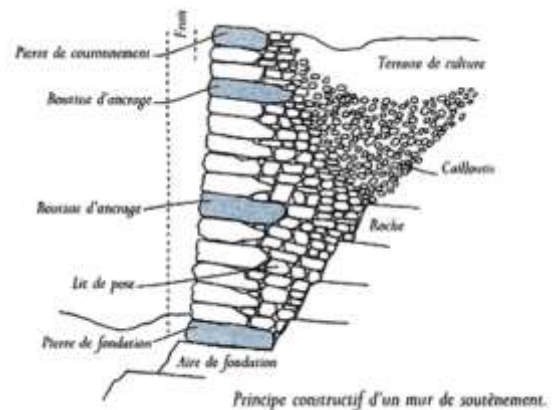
Schematic section of a retaining wall, construction elements. Diagram "La pierre sèche, mode d'emploi" by Christian Lassure, ed. Eyrolles, 2014
